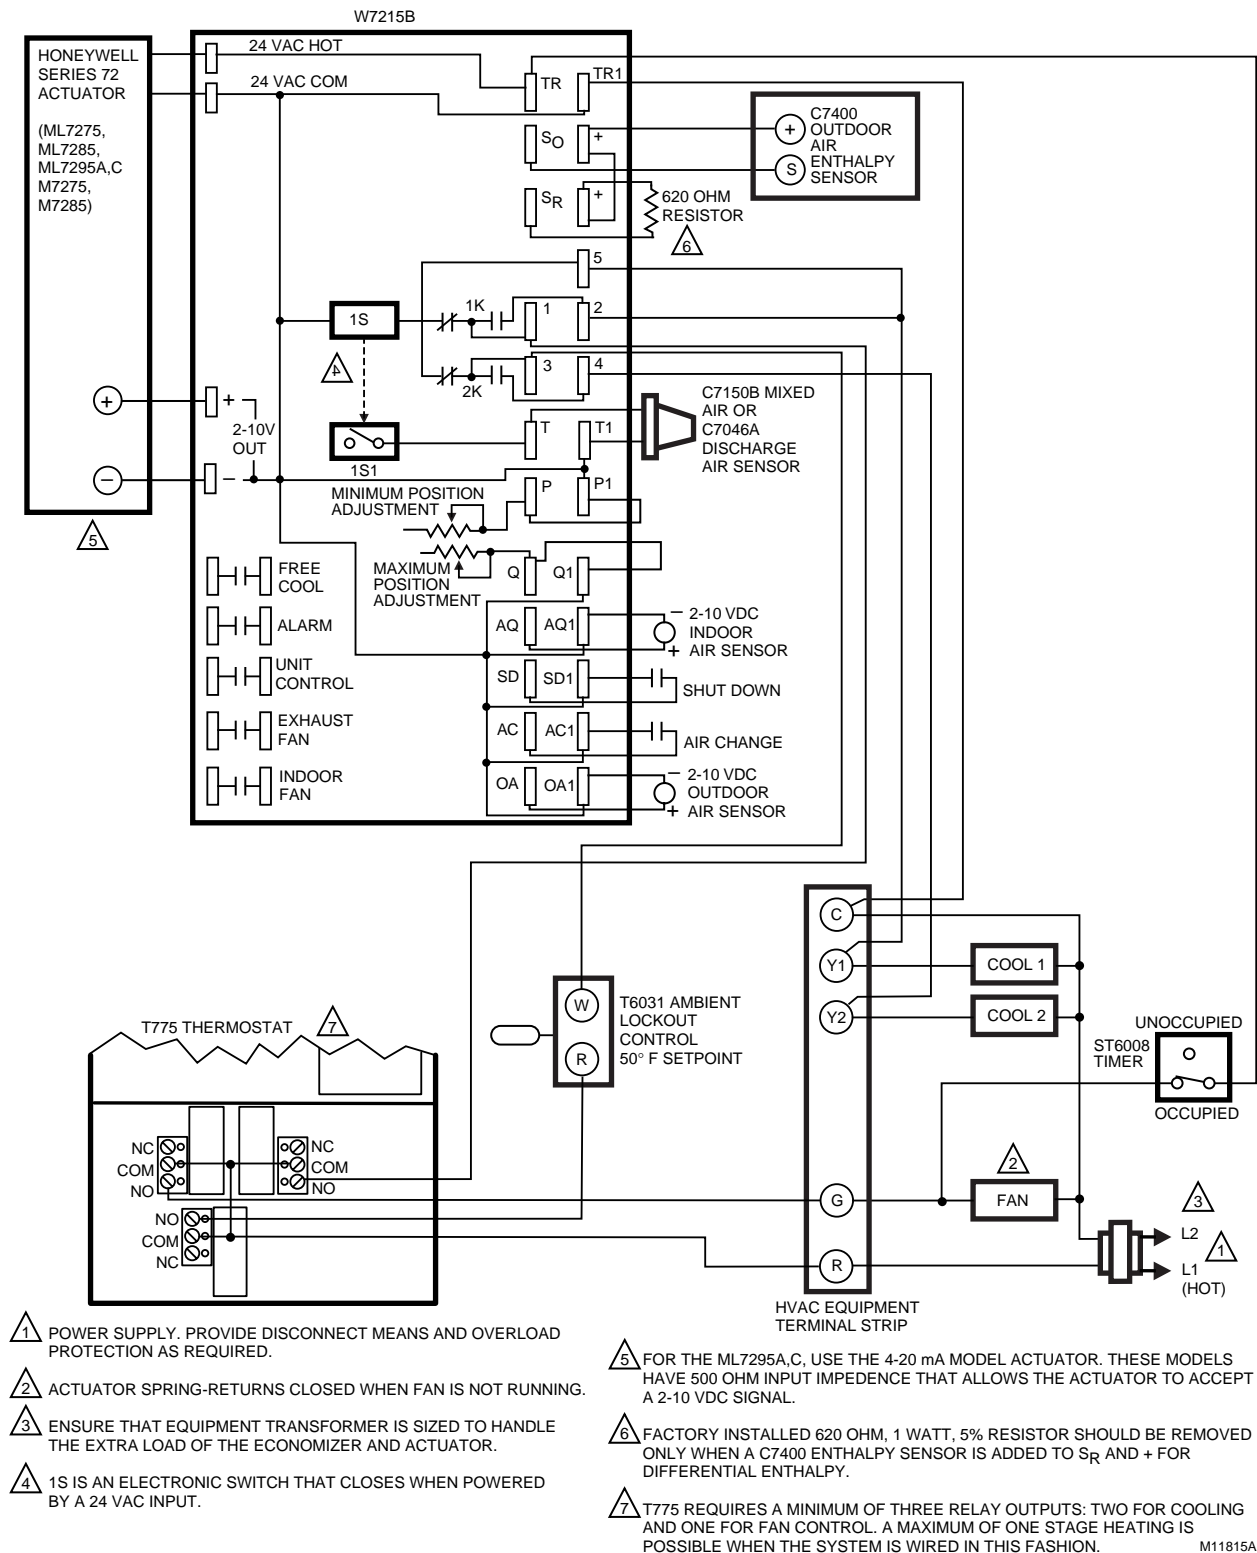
W7215B used with T775 Controller and Honeywell Series 72 Actuator.
